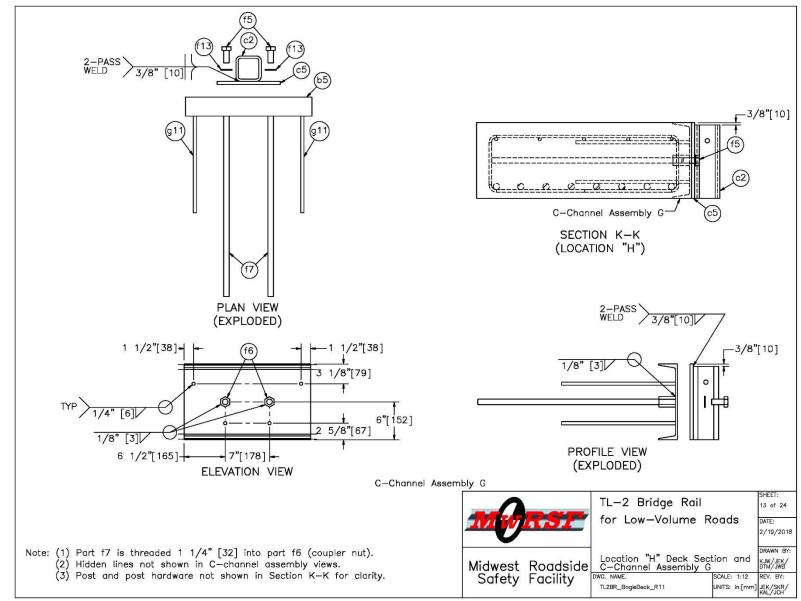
Bogie Testing Matrix and Setup, Location "H" Deck Section and C-Channel Assembly G
